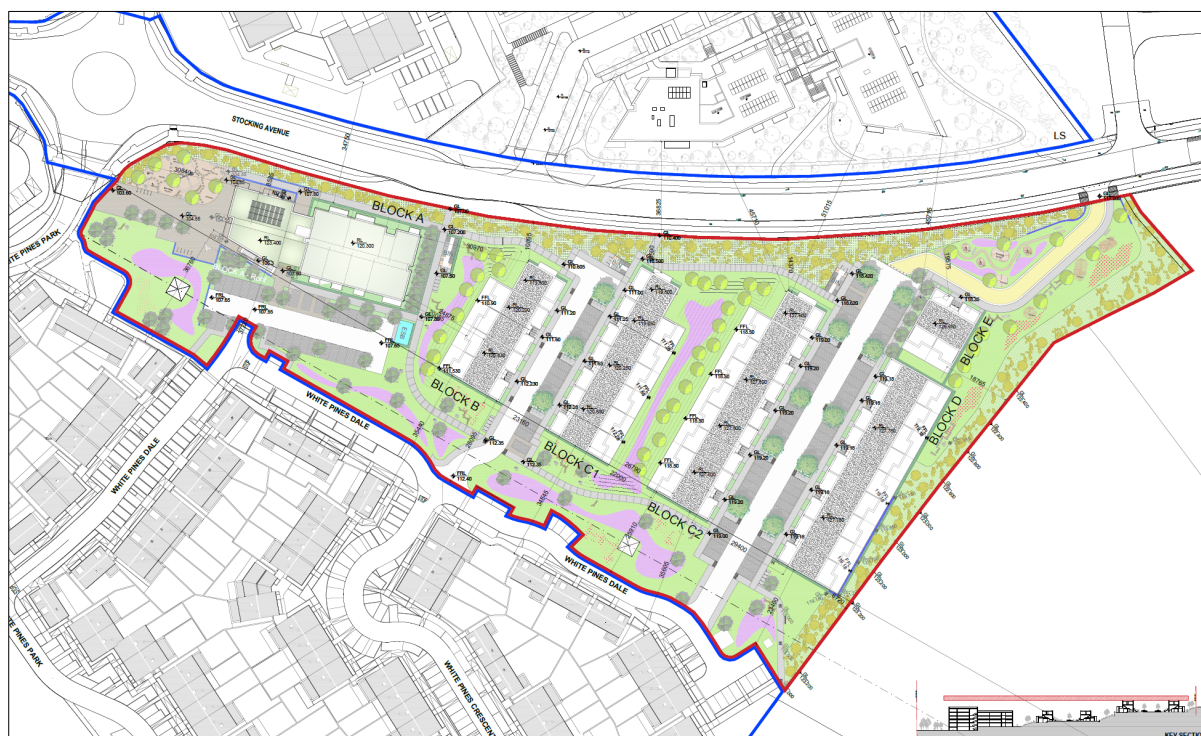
Proposed Site Plan - Level 1, Drawing No. 3.2_011 (Source: RAU)
